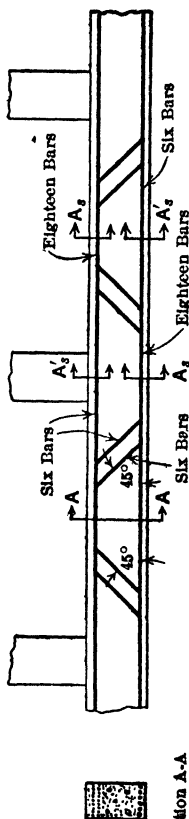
Typical Design for a Continuous Footing, Showing Arrangement of Bars
